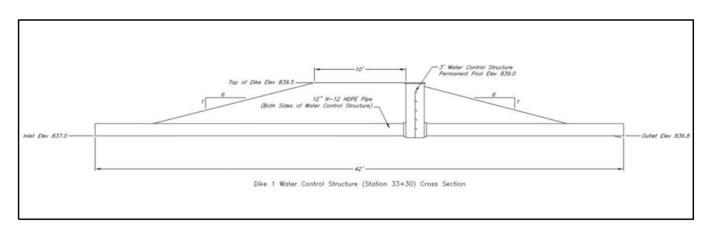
CROSS SECTION OF DIKE 1, DIKE 2 HAS THE SAME TOP WIDTH AND SIDE SLOPE
